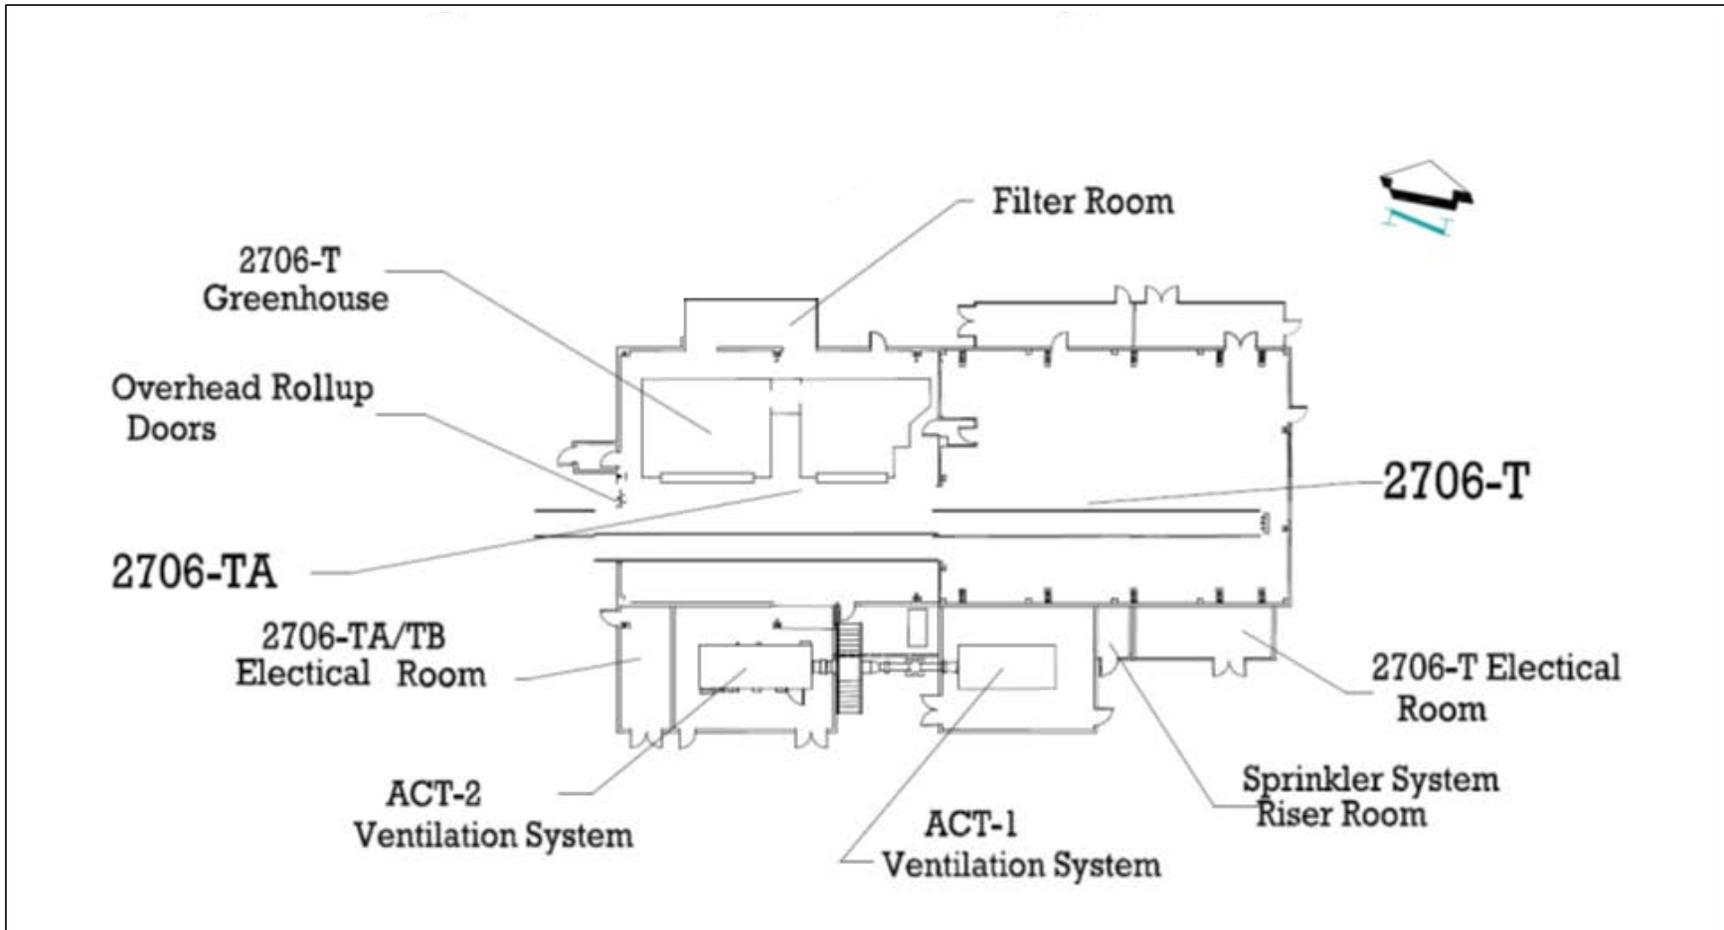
General Floor Plan of the 2706-T and 2706-TA Buildings
